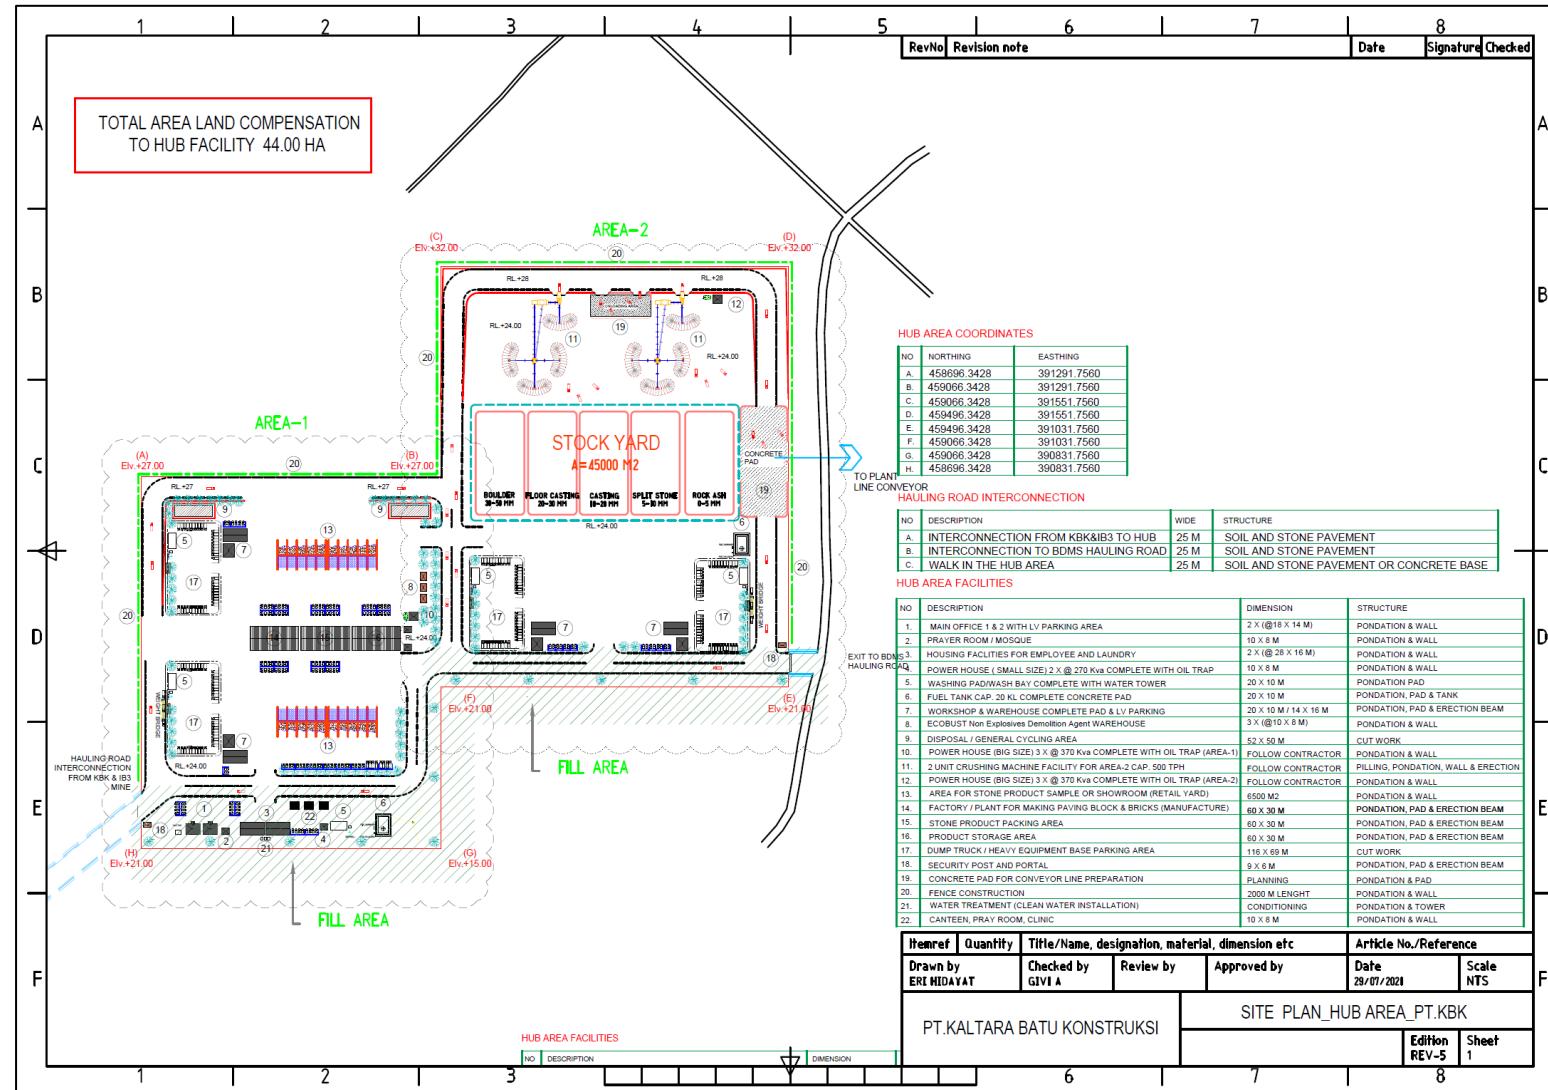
Layout plan (source: PT KBK, file ref: SITE PLAN_Hub Area_PT.KBK (REV_A).pdf, Sept 2021)
